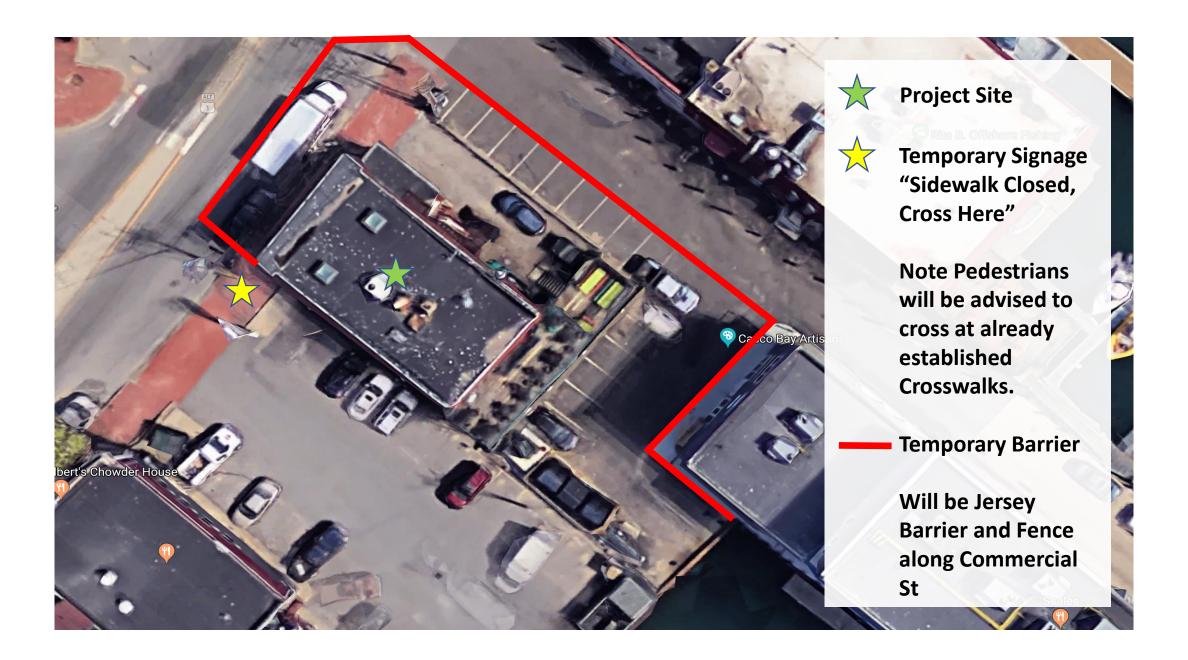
EXHIBIT A – SITE LOGISTICS PLAN FOR 84 COMMERCIAL STREET
